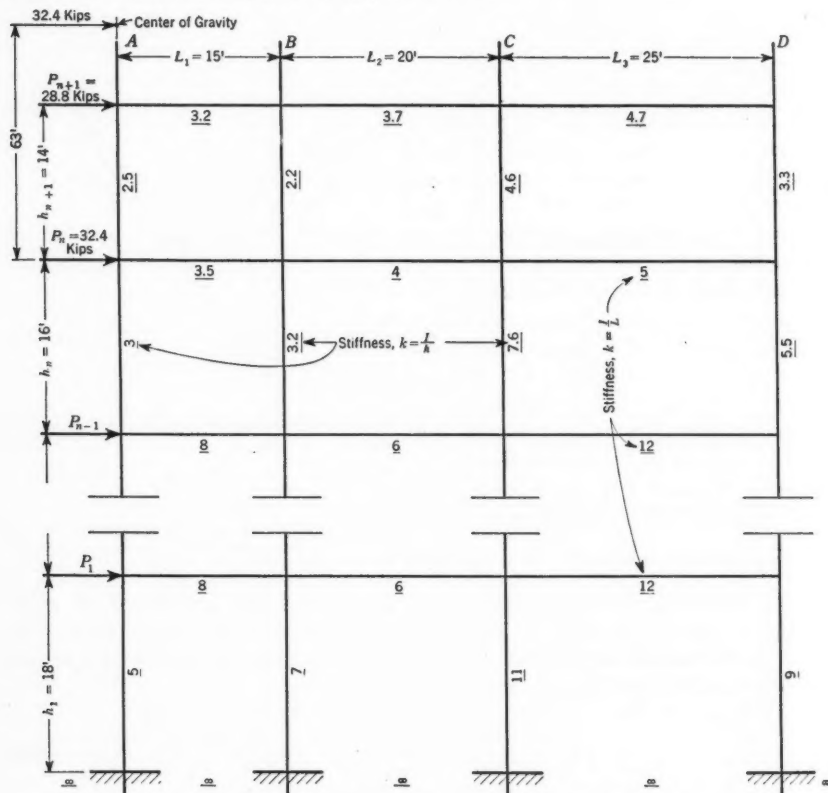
DIAGRAM OF TYPICAL STRUCTURAL FRAME
